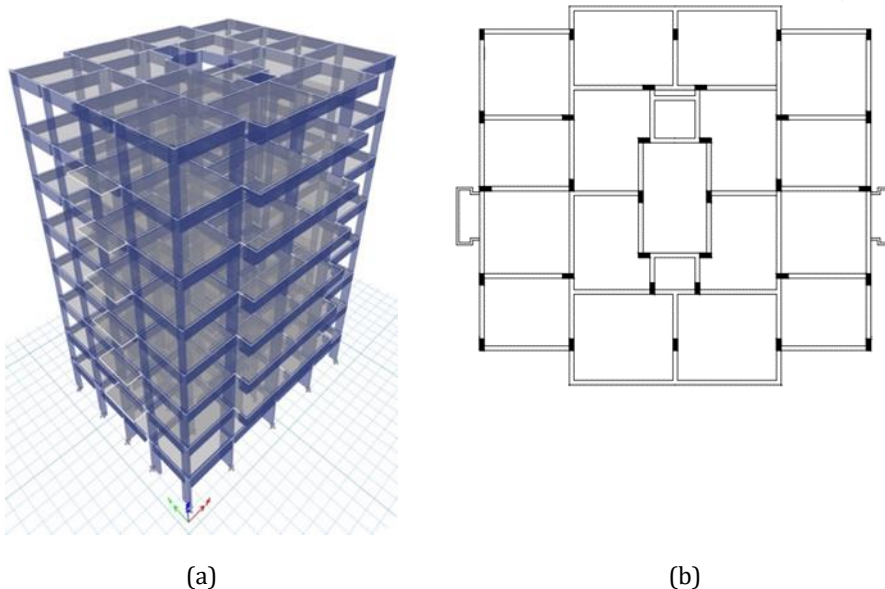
8-Story building (a) Model layout in ETABS, (b) Plan Layout
